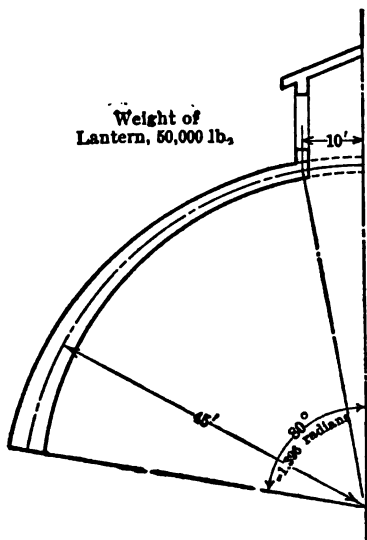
Smooth-shell Concrete Dome with Lantern and Eye. See Example
